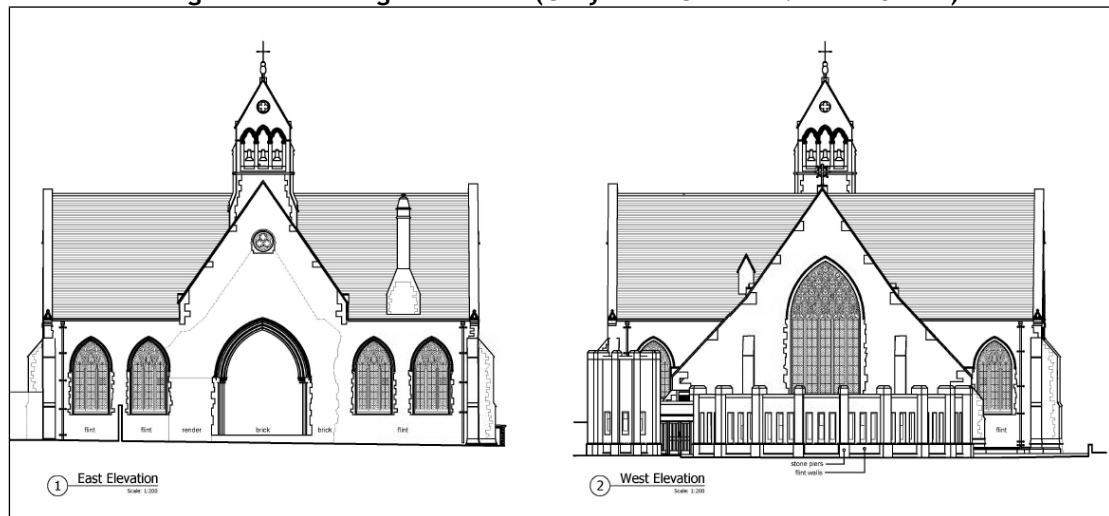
Existing elevations (Greyfriars Church, East 7 West)
